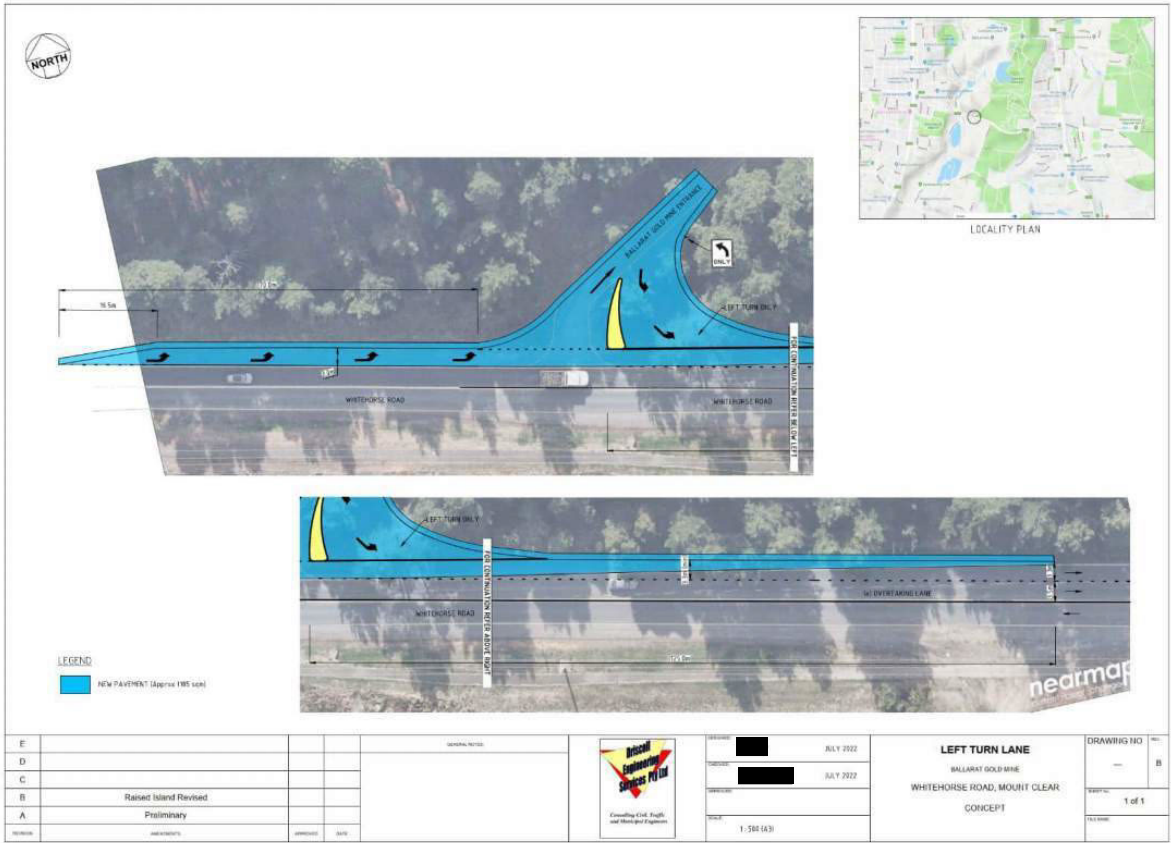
Proposed accessway to the Works Area from Whitehorse Road.
